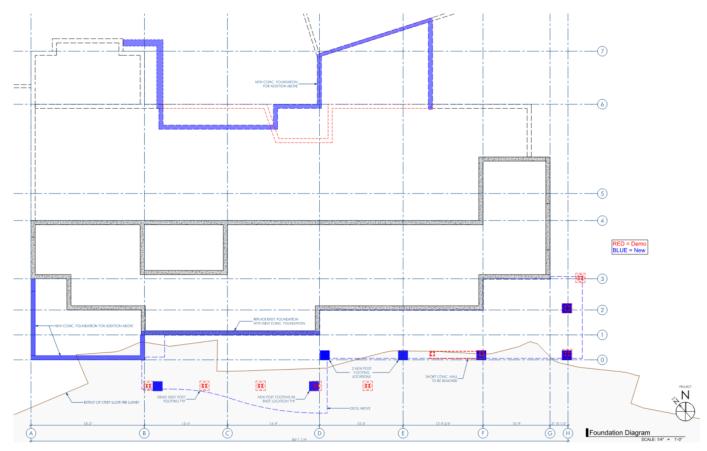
Foundation Exhibit. New post footings are indicated by blue boxes; post footings and foundation wall to be removed are indicated by red boxes; new concrete foundations are indicated in blue surrounding the border of the foundation. The steep slope critical area is shaded; the top-of-slope buffer is immediately north of the steep slope critical area and extends approximately to the front of the primary structure (farthest north).
